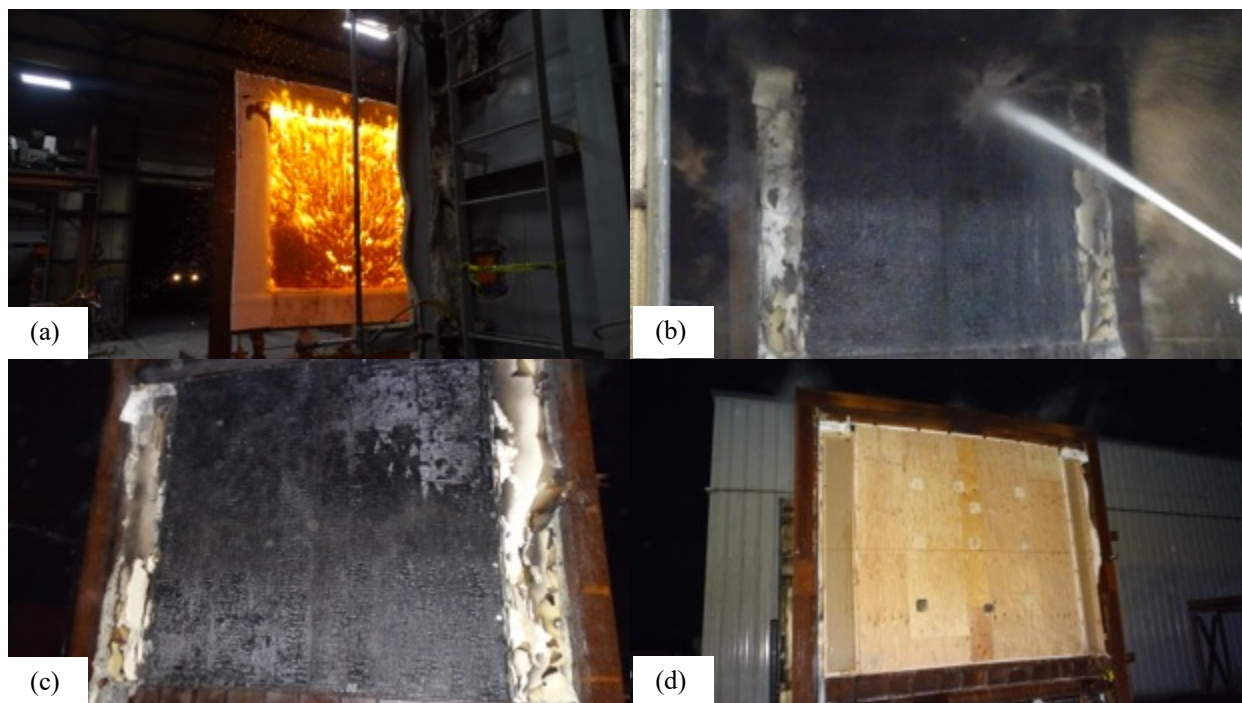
Test 1 showing (a) after fire endurance, (b) during hose-stream, (c) exposed side after hose-stream, and (d) unexposed side after hose-stream.
